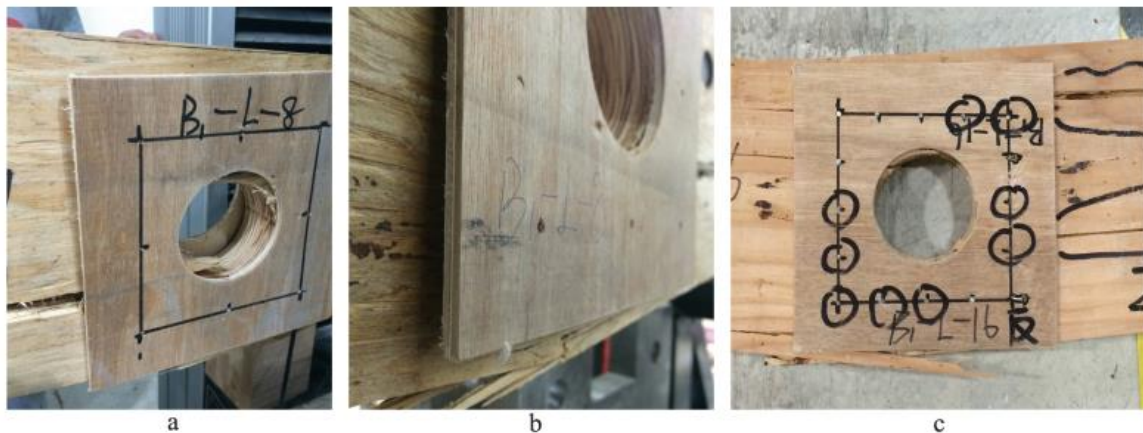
Observations of nailed plywood: (a) rotation of the plywood, (b) separation between LVL and plywood, and (c) nails sinking around cracks
